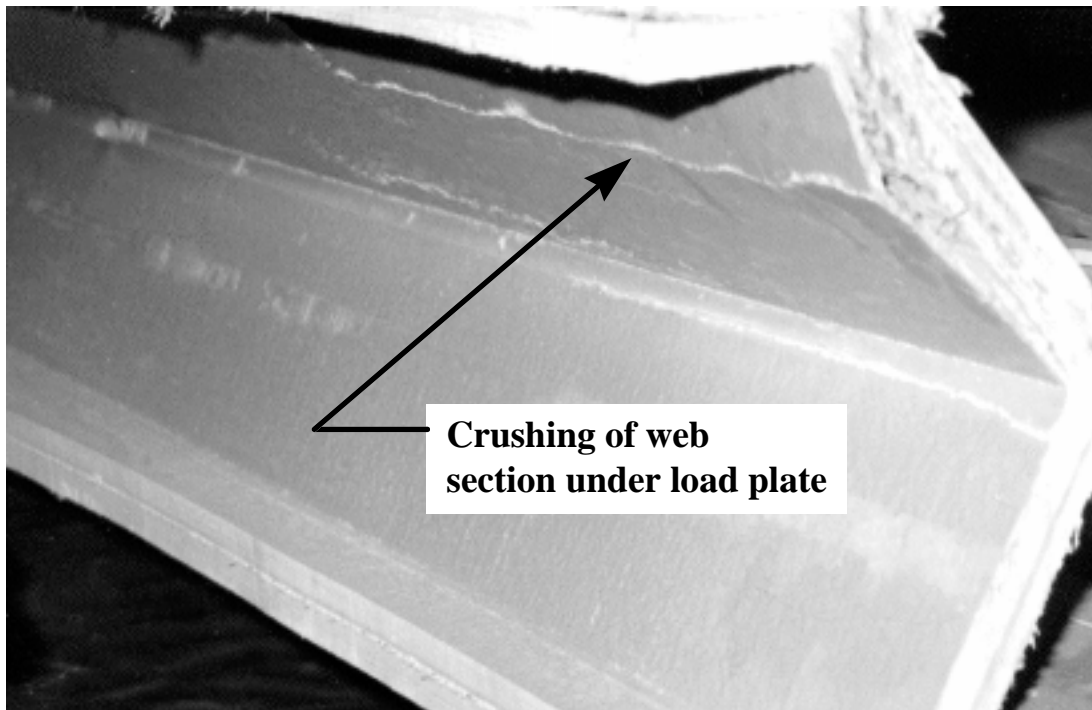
Close-up of pultrusion H-deck after failure showing crushing of web section under load plate.
